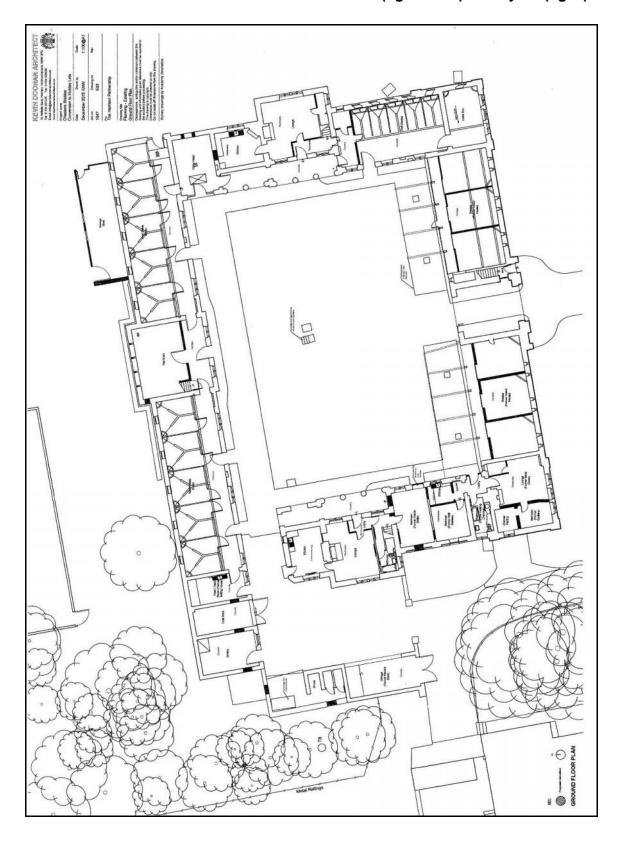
Chesters Stables. Ground-floor plan (Doonan Architects Drawing E03).
